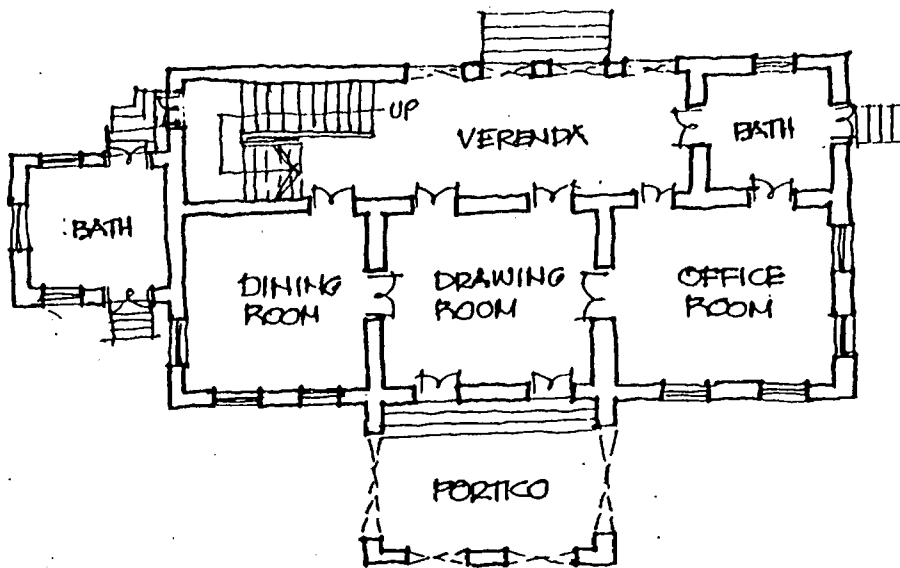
Ground floor plan, bungalow of S.P. Dinajpur
